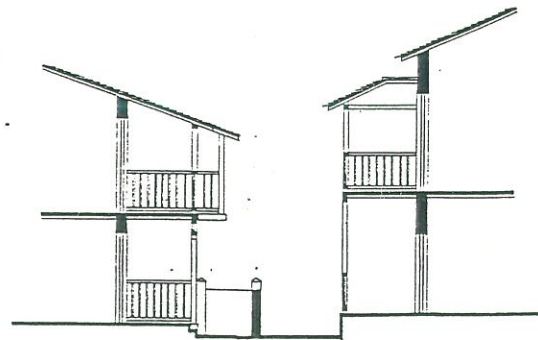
EXISTING STREET SECTION SHOWING FRONT OPEN SPACE
